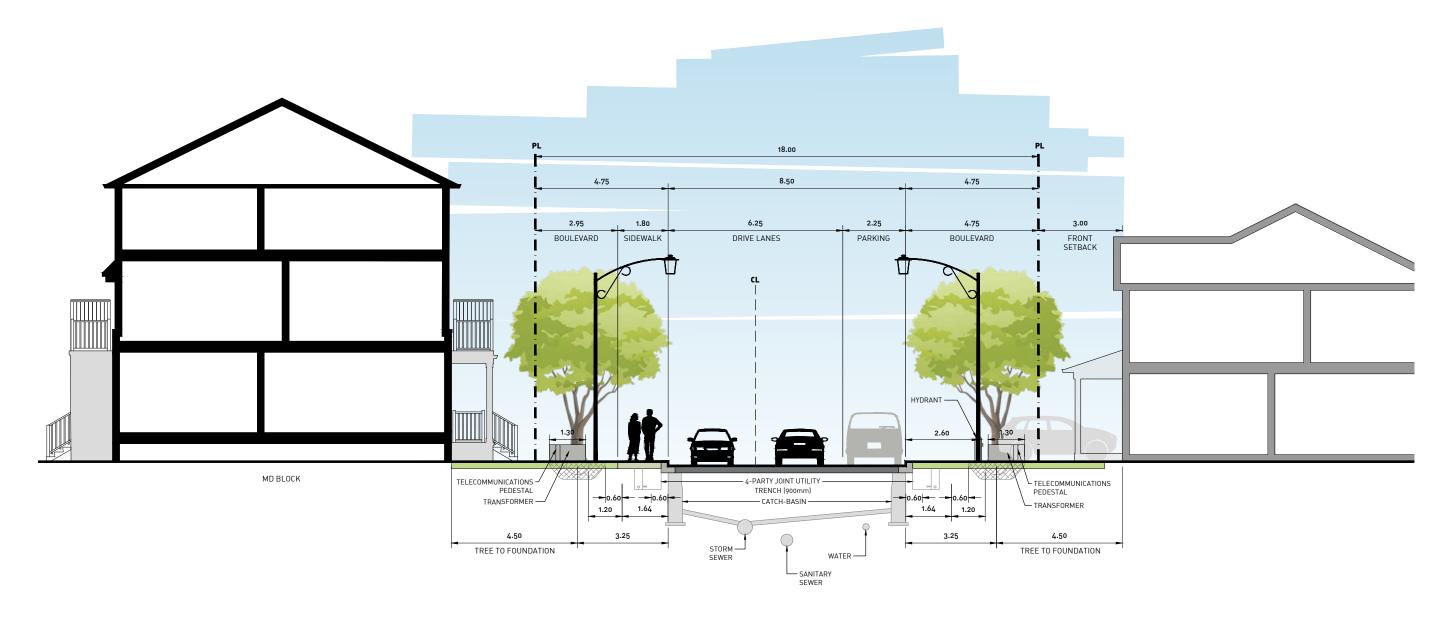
18.0m Local Road (Les Emmerson) Right-Of-Way Section
